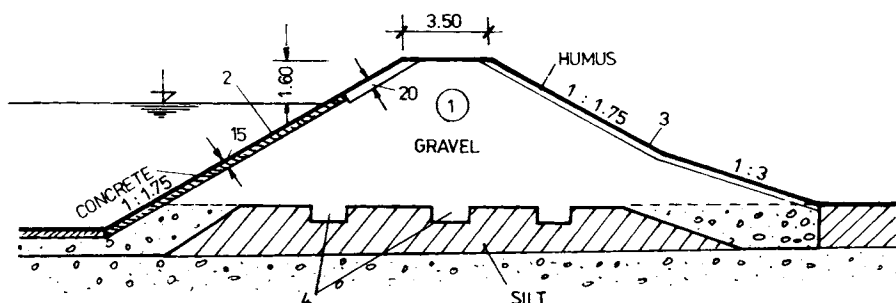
Cross-section of head-race canal of hydroelectric plant in Ladce. 1 — dam body, 2 — concrete apron, 3 — downstream slope protection, 4 — stabilizing “teeth”.
